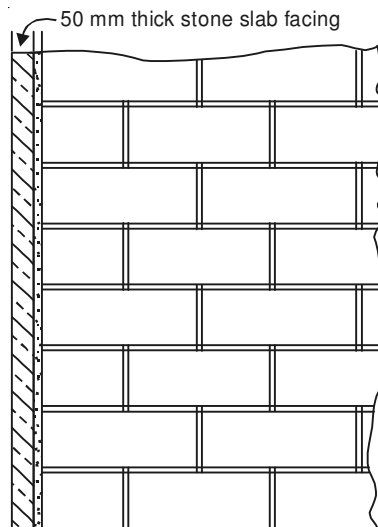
Composite masonry—stone facing with brick masonry backing
